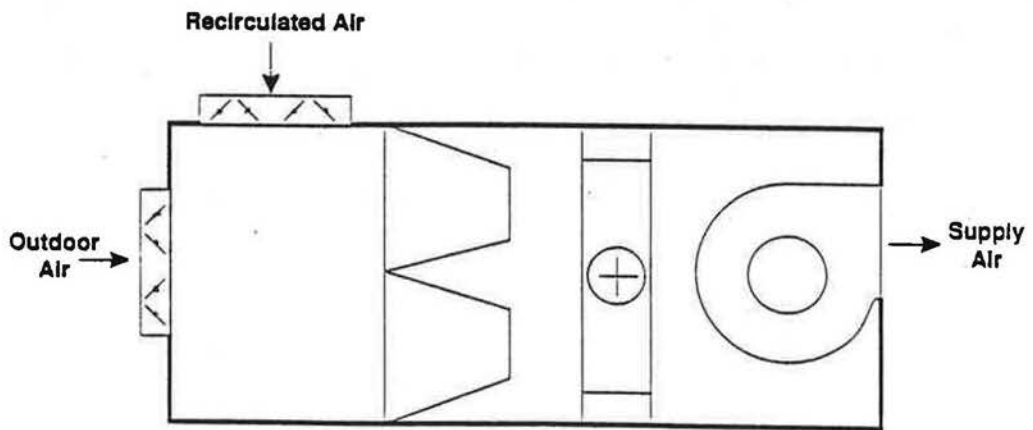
AIR HANDLING UNIT WITH MIXING SECTION
